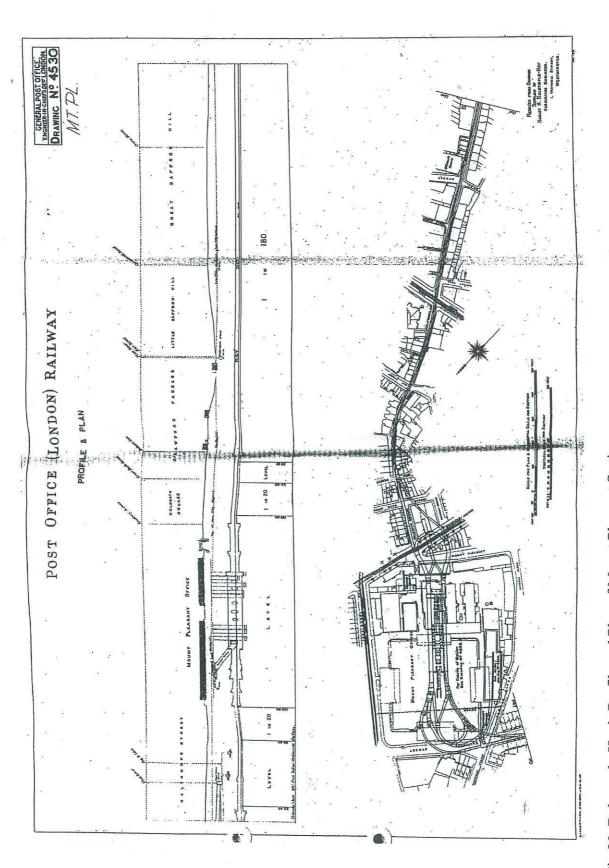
Dalrymple-Hay's Profile and Plan of Mount Pleasant Station
